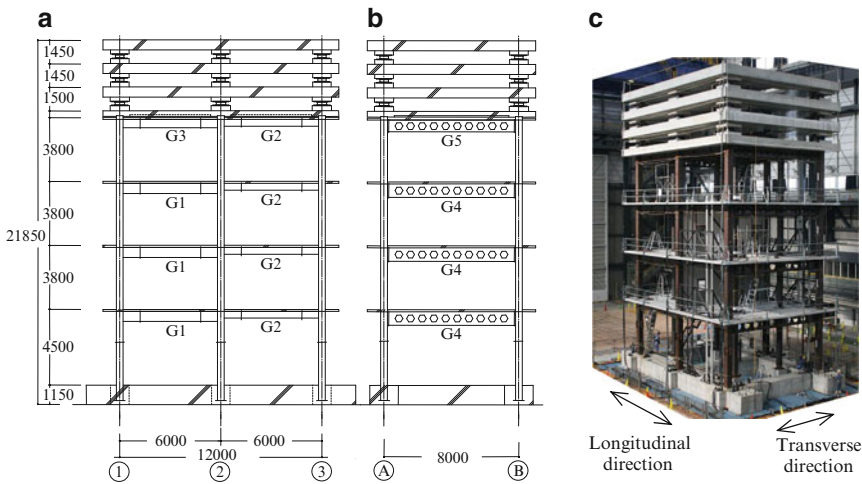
E-Defense test specimen (unit: millimeters): (a) elevation-A, (b) elevation-1, (c) overview of setup
